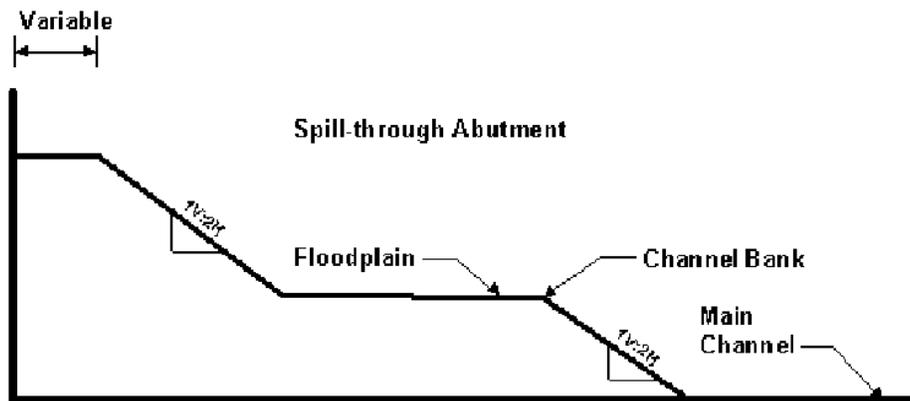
Section view of a typical setup of spill-through abutment on a floodplain with adjacent main channel.
